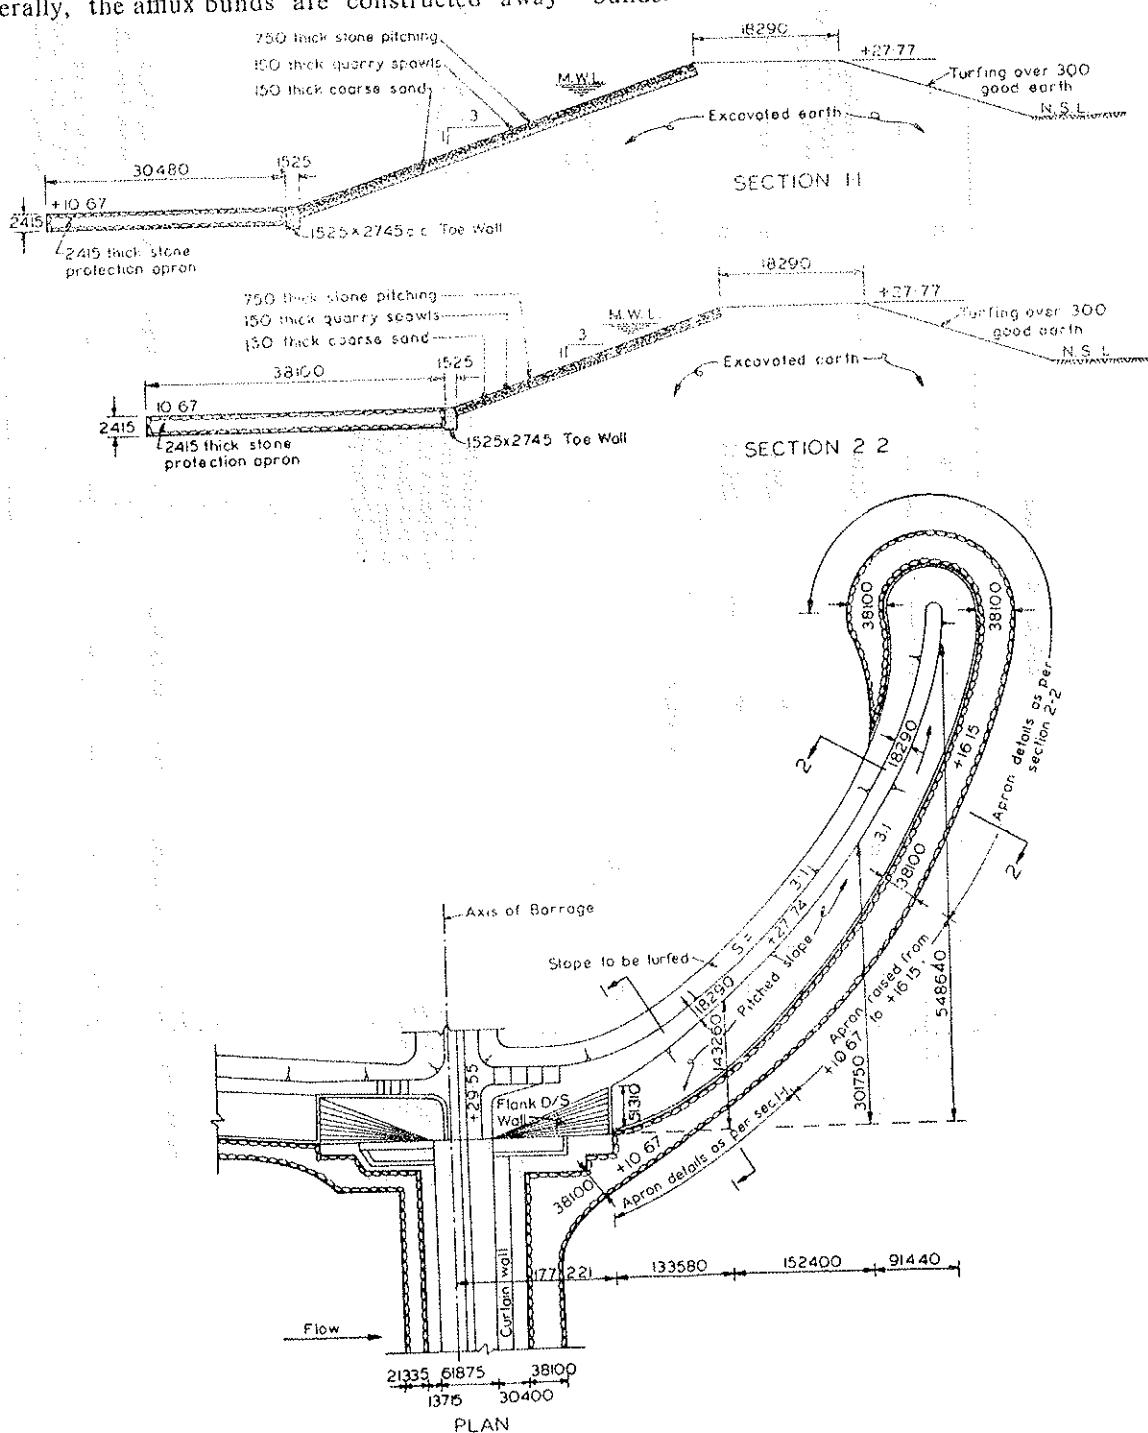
Typical Layout and Sections of Downstream Guide Bund.
